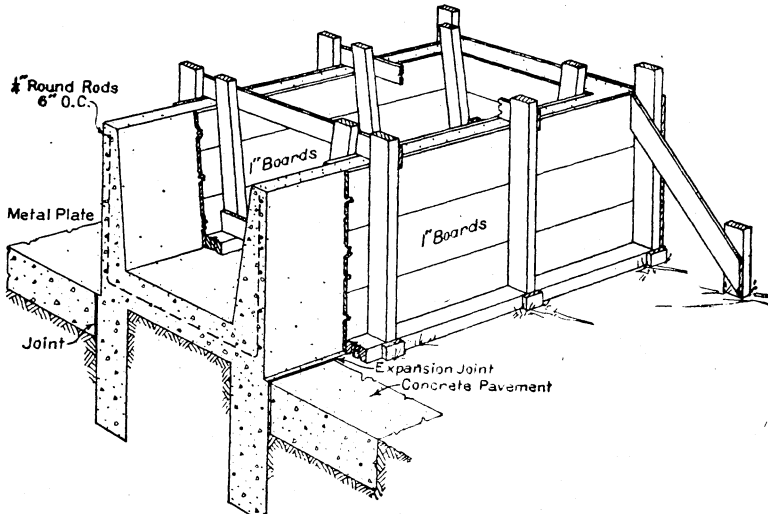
Construction of rectangular trough directly on the ground. The pavement is laid after the trough is completed.
